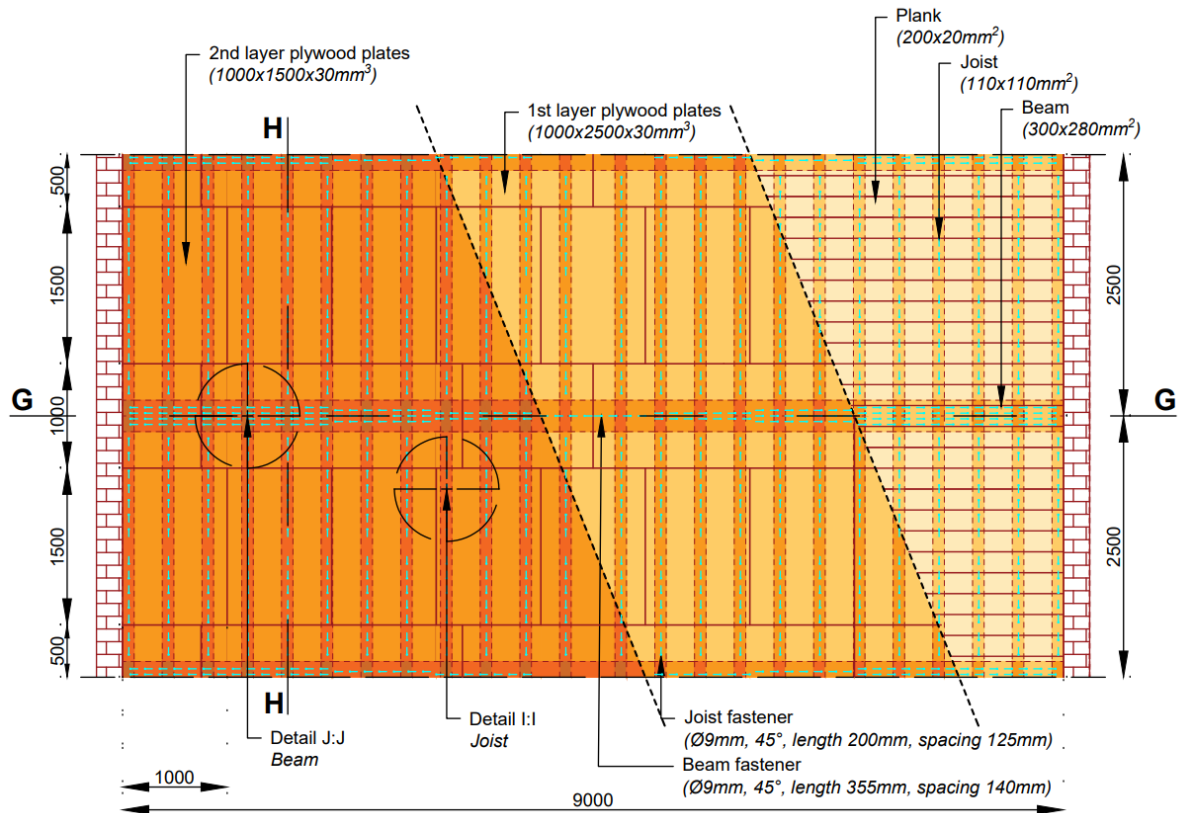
Top view of the attic floor after strengthening the joist direction
